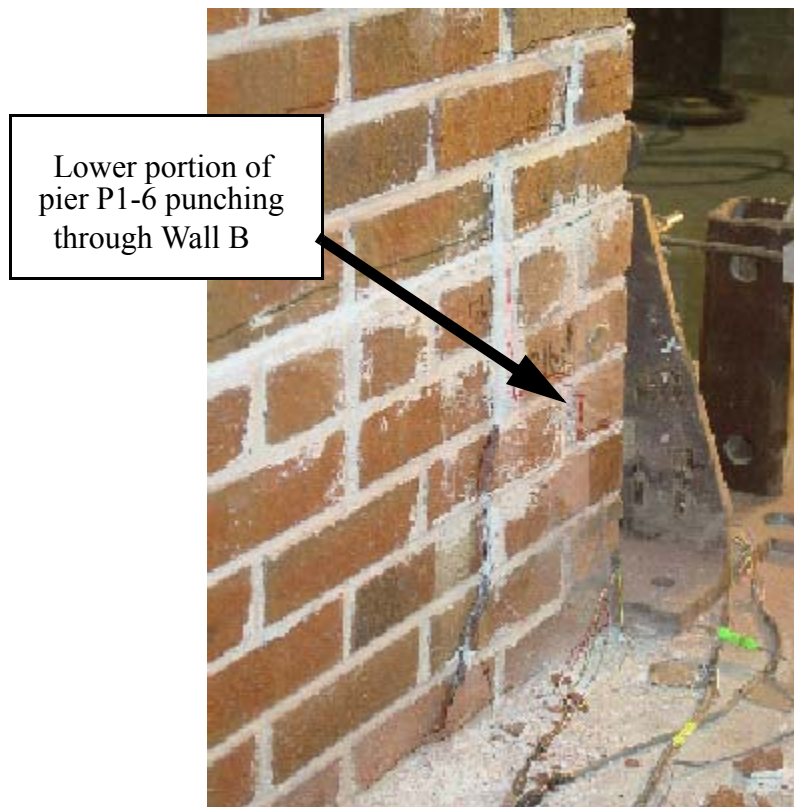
Photograph showing the damage to the lower corner between Walls 1 and B following Test Run 19.
